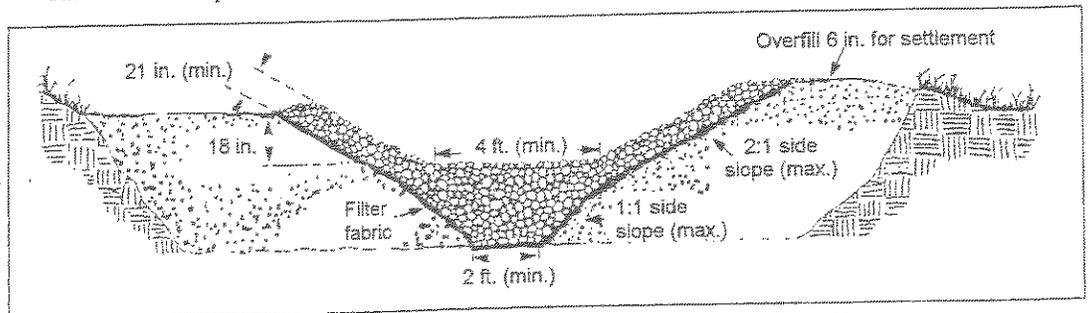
B. Earth embankment and stone outlet section of a temporary sediment trap.
